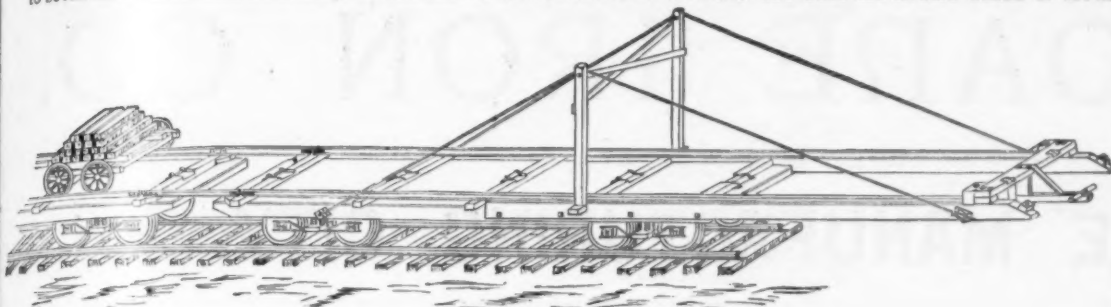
THE HARRIS TRACK-LAYING MACHINE.
